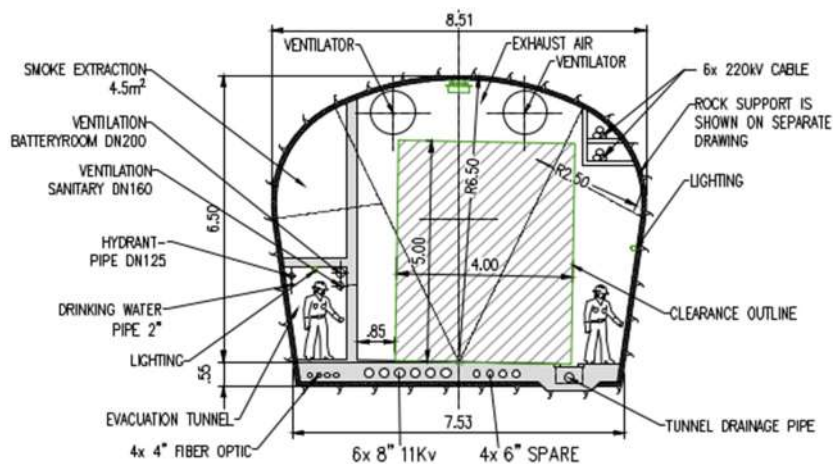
Main Access and Power Evacuation Tunnel – typical section
